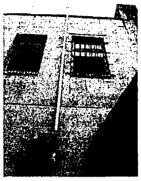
is an exterior view of the HS3000 high suction fan installed for system 4A in Building 4.
